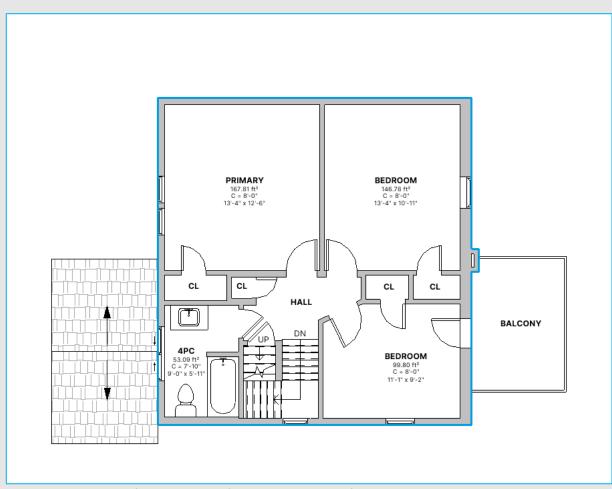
Roof Plan Represented with the Second Floor Plan
